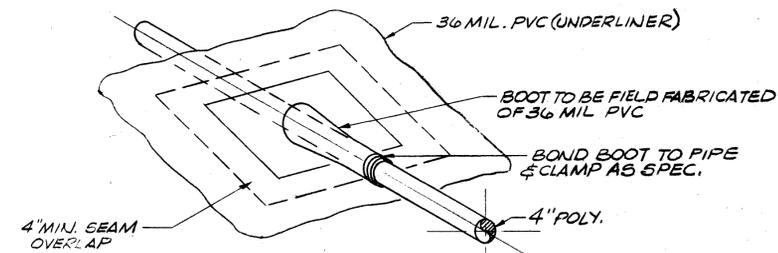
DETAIL OF LINER SEAMS AROUND 6" TRUNKLINE
